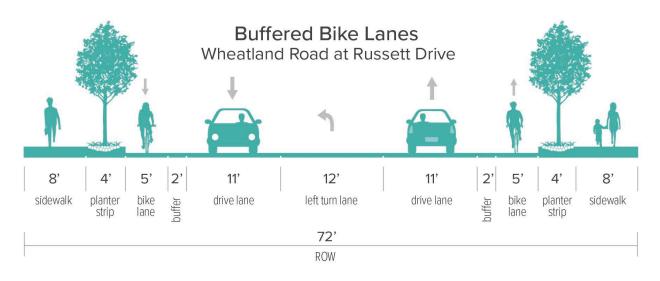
BUFFERED BIKE LANES CROSS SECTION (AT RUSSETT DRIVE)
